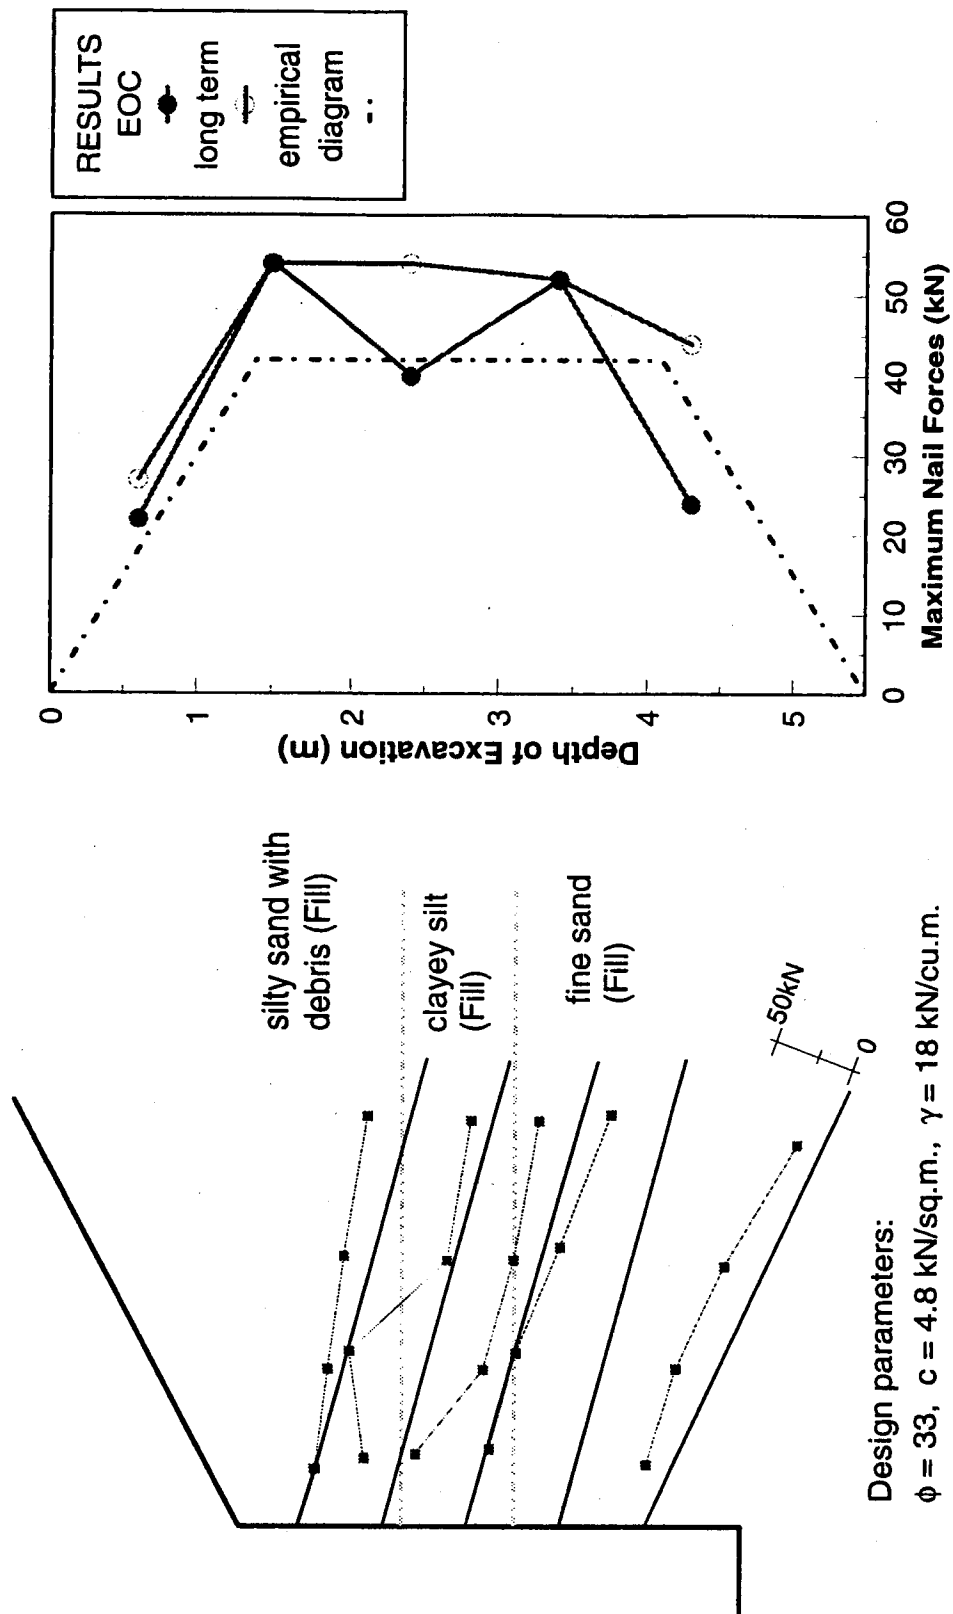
Swift-Delta Soil Nail Wall Station 2 axial nail force results
